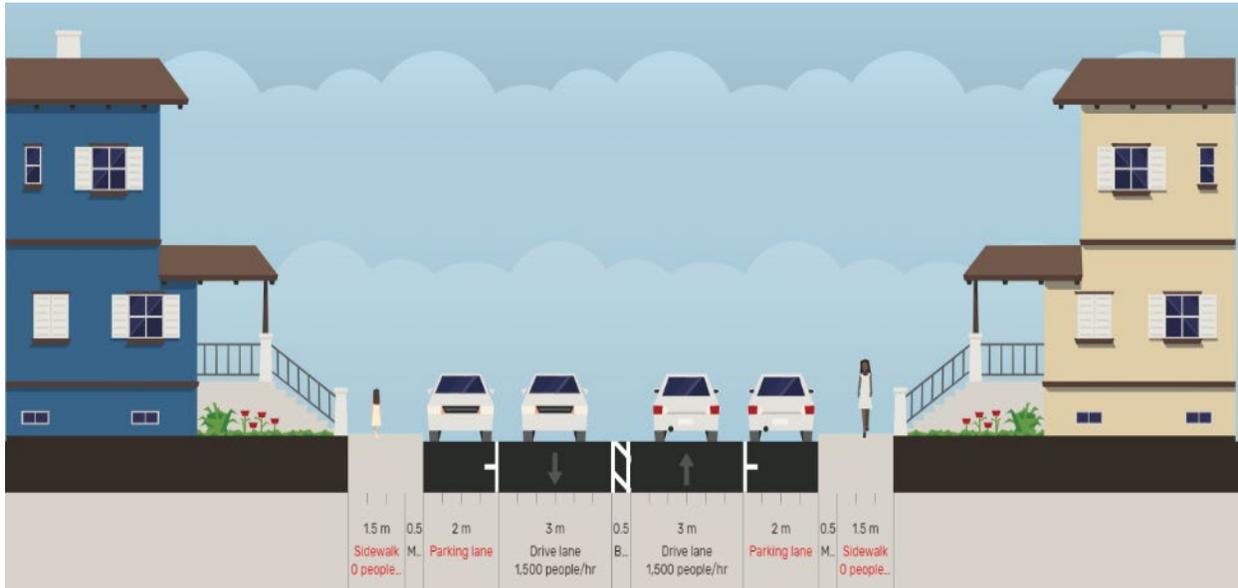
Lake Drive at Lorne Street – Hedge Road
